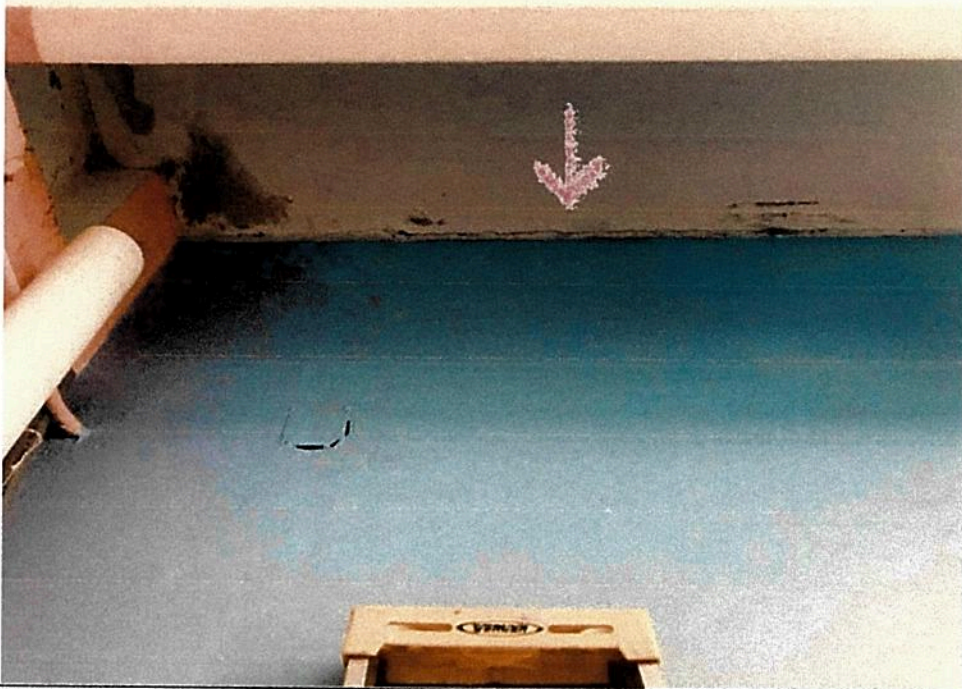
Horizontal separations or cracks at CMU division walls joint with the slab or bottom of the 2ble T web (this image)
